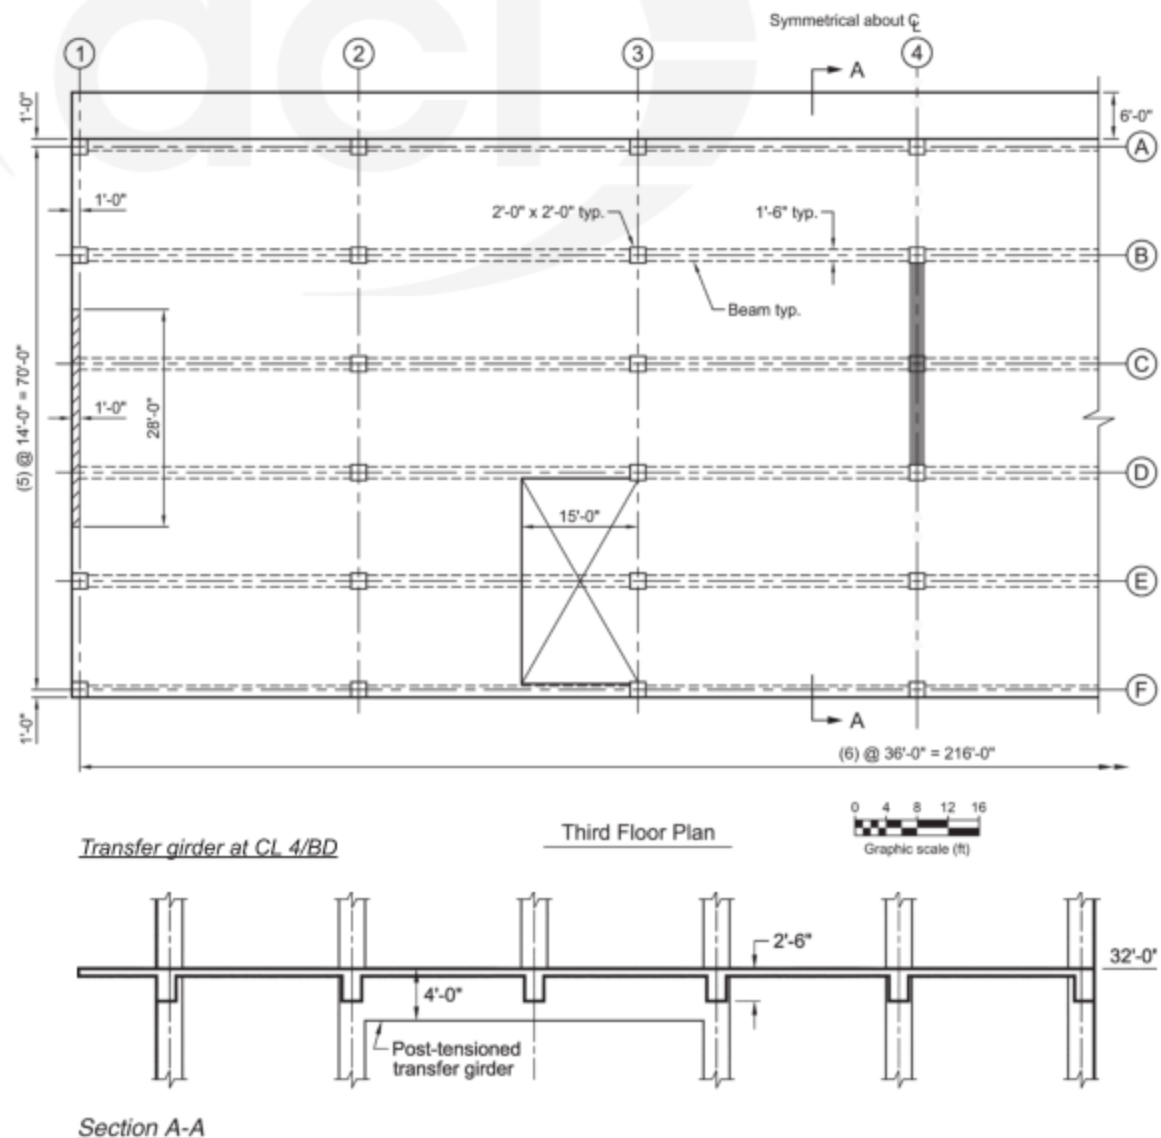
Plan and partial elevation of third level transfer girder and beams.
